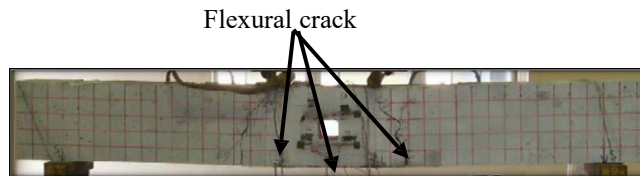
Shear failure of beam B4 at load 28.68kN.
